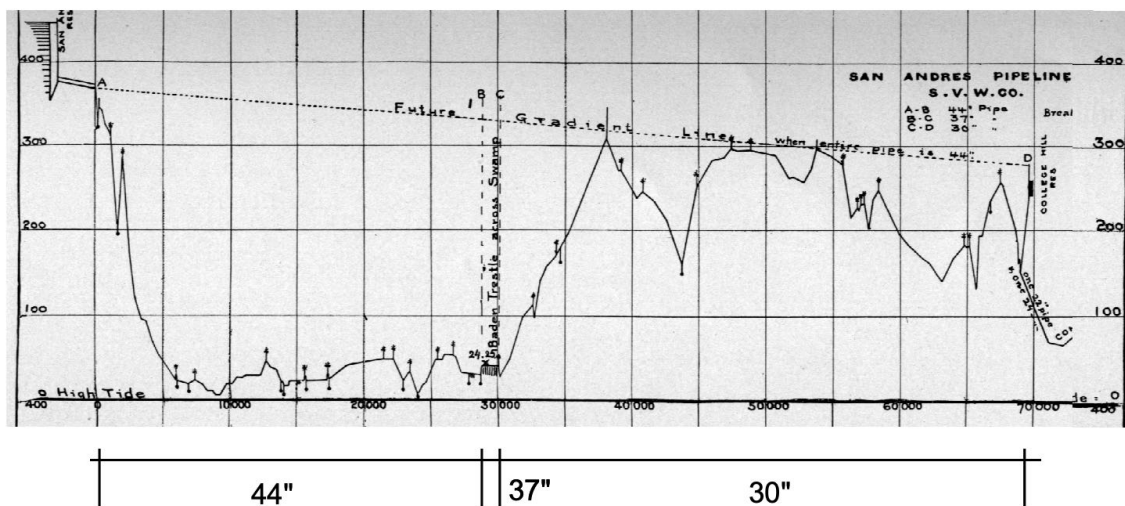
San Andreas Conduit Profile and Pipe Diameters (SCWV drawing)
